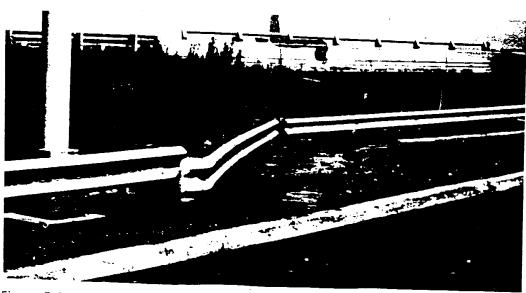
Guardrail sections are joined at angles that are too sharp.
